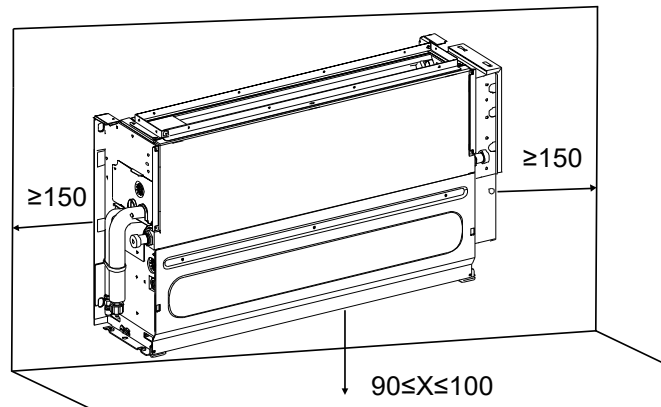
F5 series (air inlet from bottom) Exposed Floor Standing space requirements (unit: mm)
